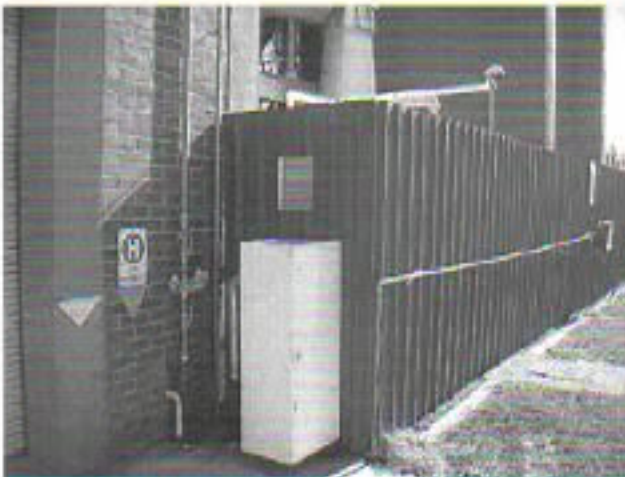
New Above Ground LFO Fill Line with Control Box and Viewing Window
